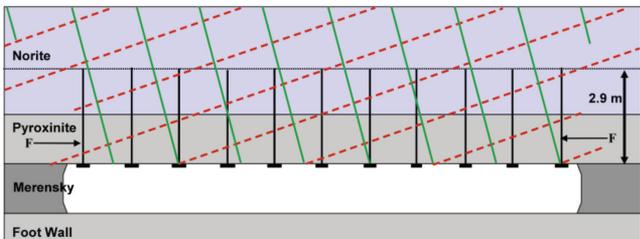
3 m cable anchors with 45° and 75° joints in a 20 m panel dipping in opposite directions
